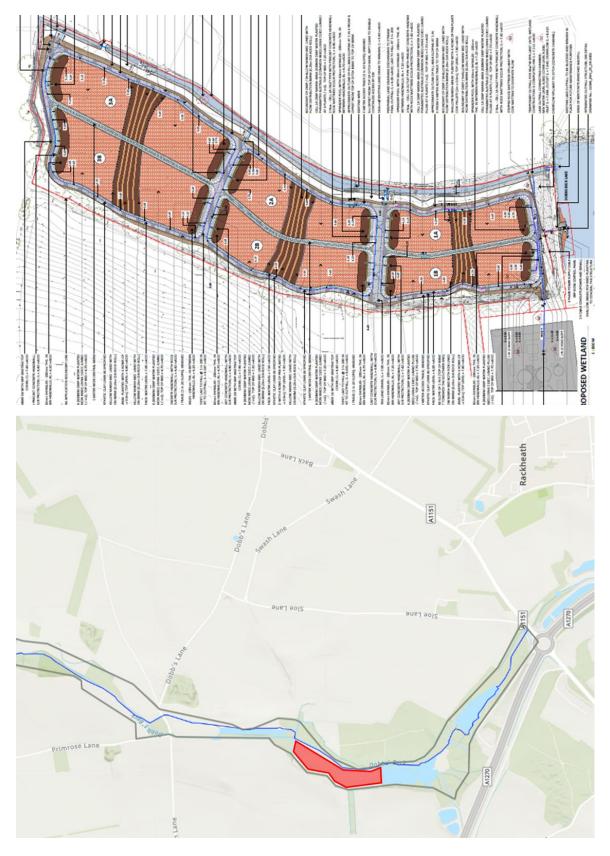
Location plan (left) and site plan (right) showing proposed new wetland. The proposed WwTW will discharge treated effluent from 1300 houses into the wetland, which will then discharge to Dobbs Beck (dark blue line within the location plan).
